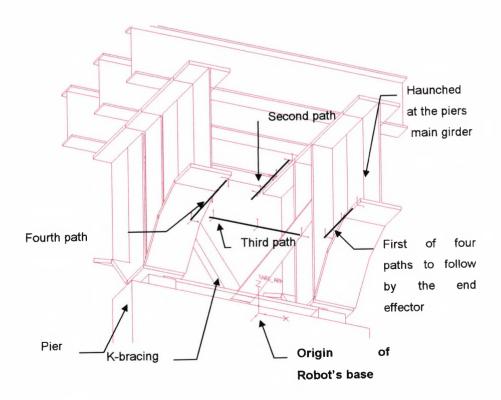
Bridge Detail [C2] according to Table 4.3
